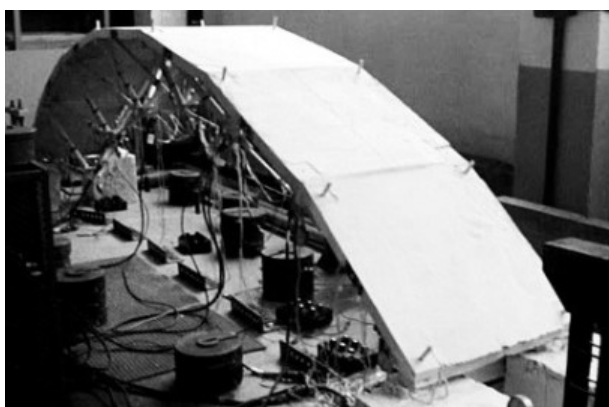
The experimental full-size sample of the steel and concrete composite cable space frame ( $l=5.6$  m)
